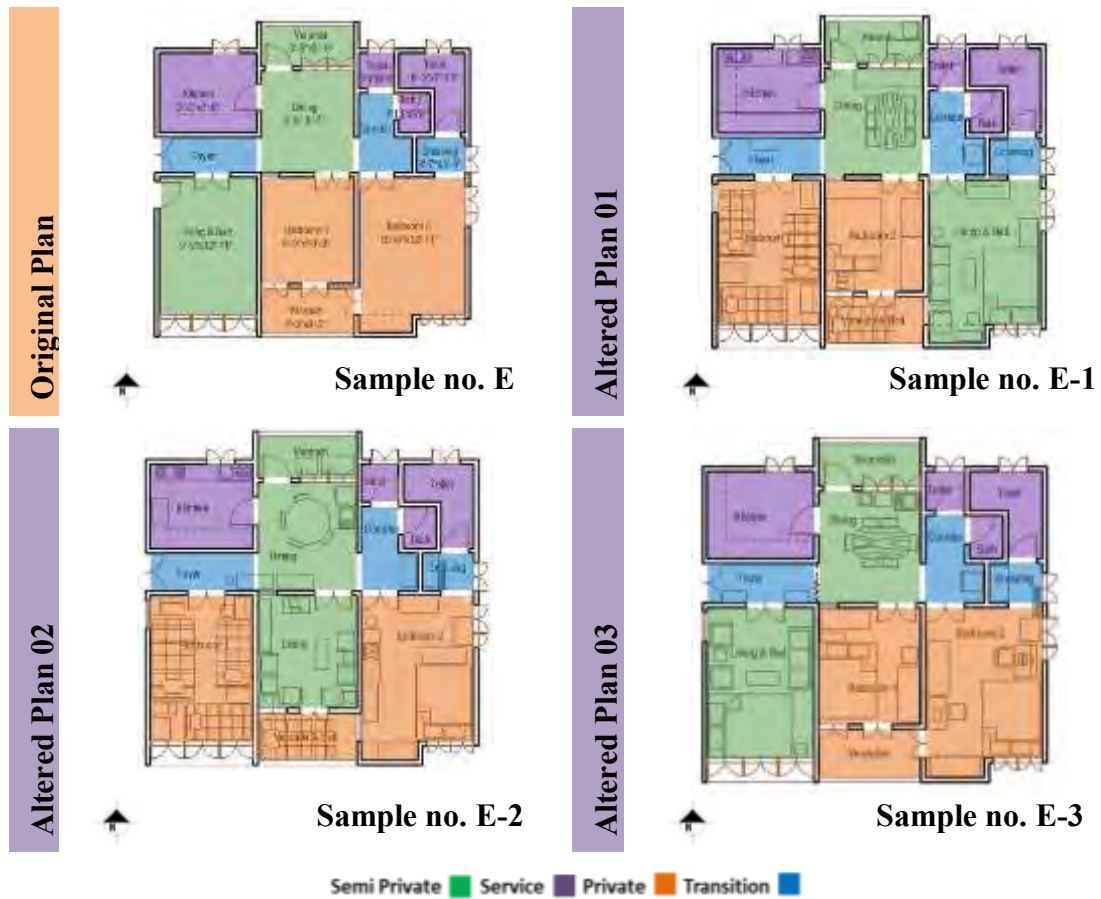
Group E; Plan of the case studies (Original and Altered)
